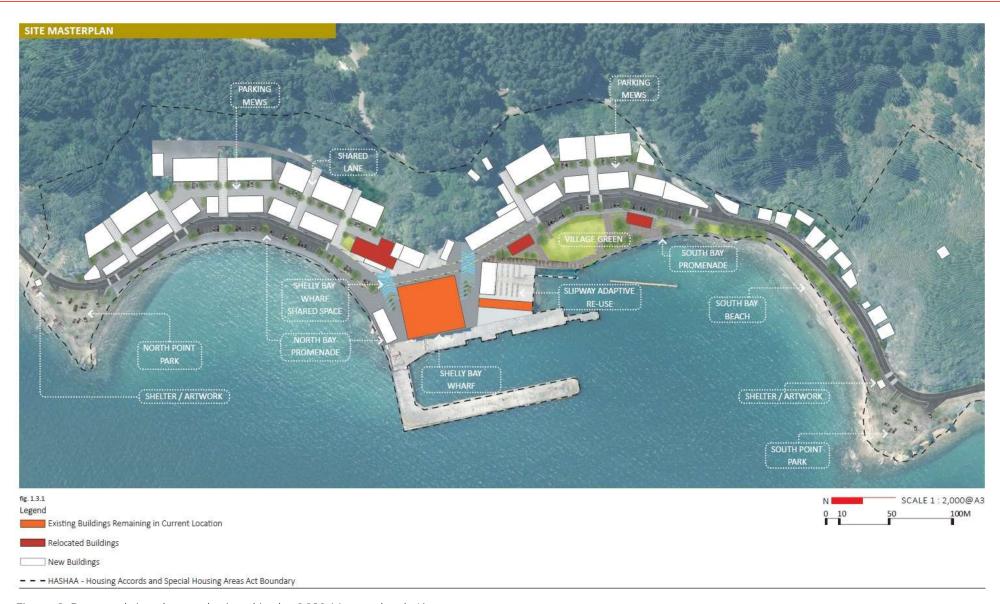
Proposed site plan as depicted in the 2019 Masterplan (p4).
